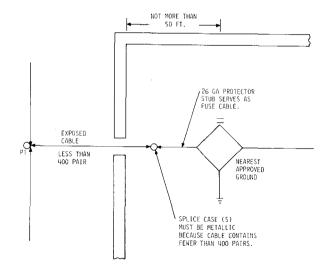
Exposed Building Entrance Cable with Protector Not More Than 50 Feet from Cable Entrance Point
